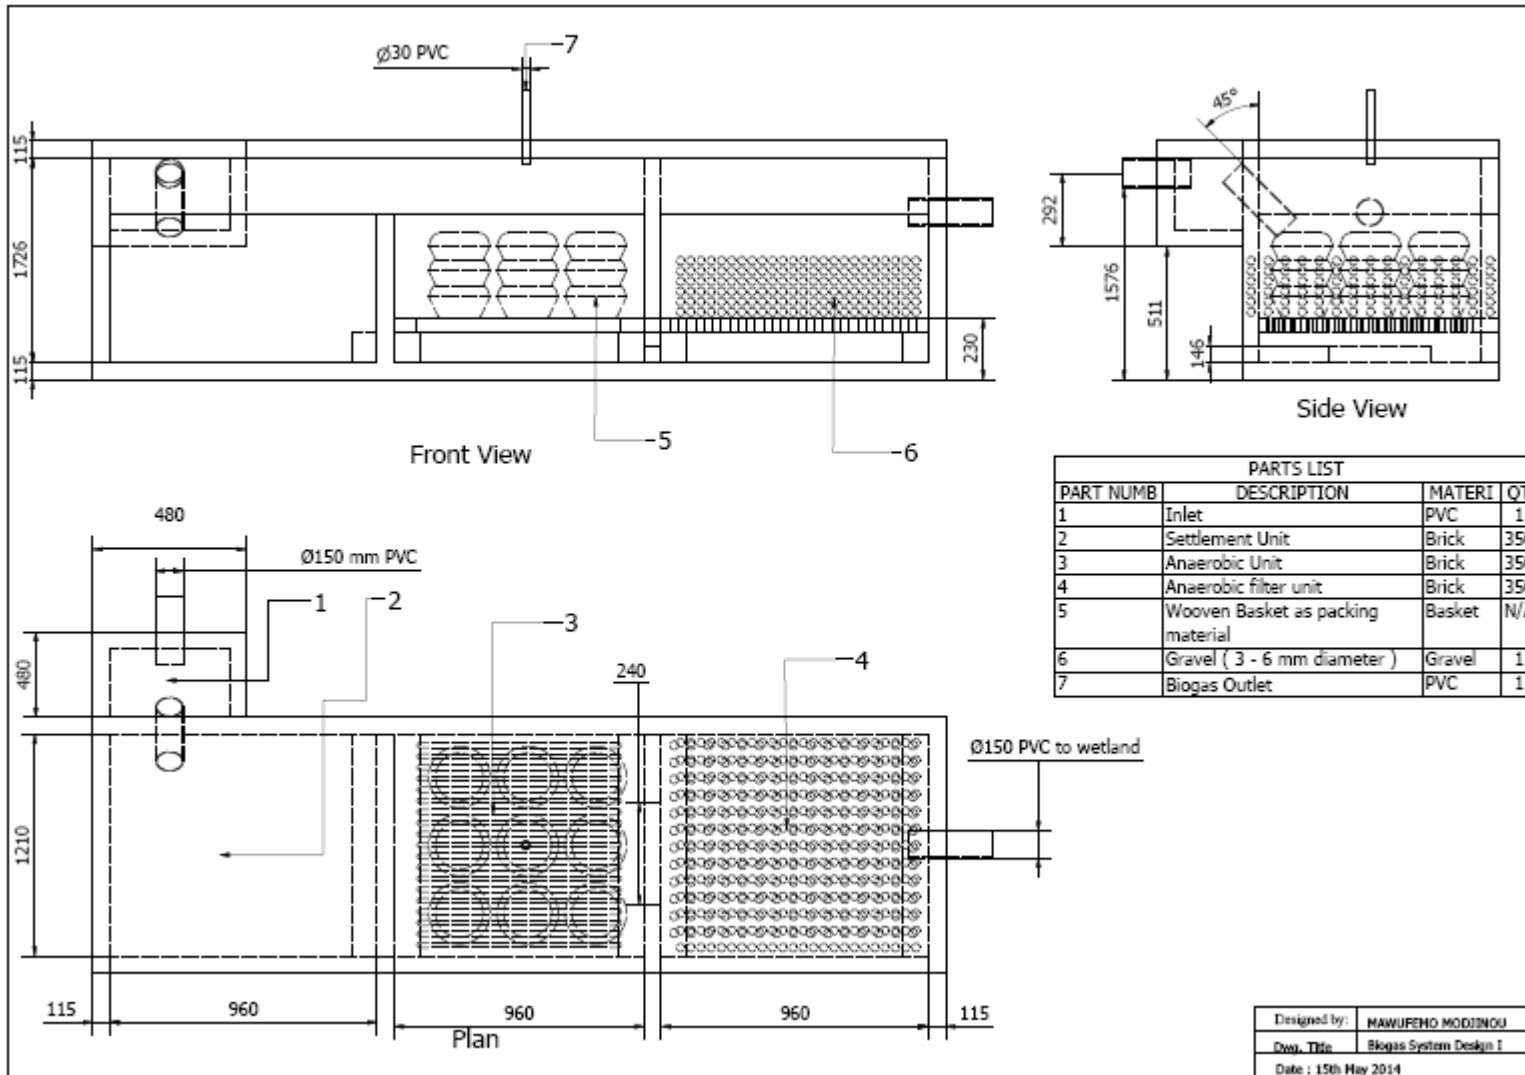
Detail drawing of the proposed Biogas Septic Tank (Design I)
